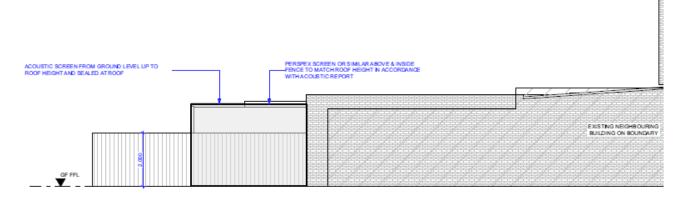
Proposed screening and additional roof along southern boundary facing 347 Barkly Street.
